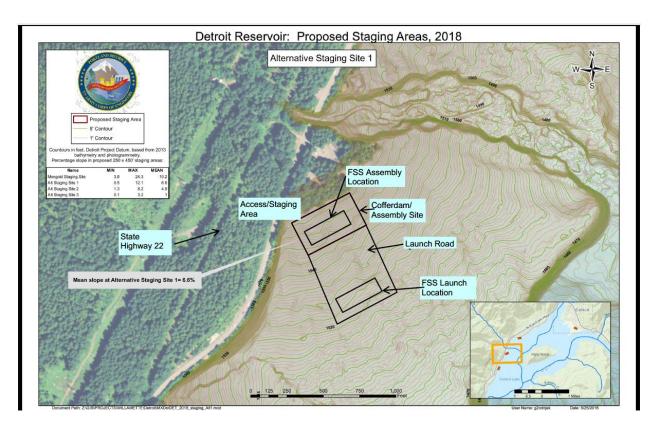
Recommended Site Layout for FSS Construction and Launch.
